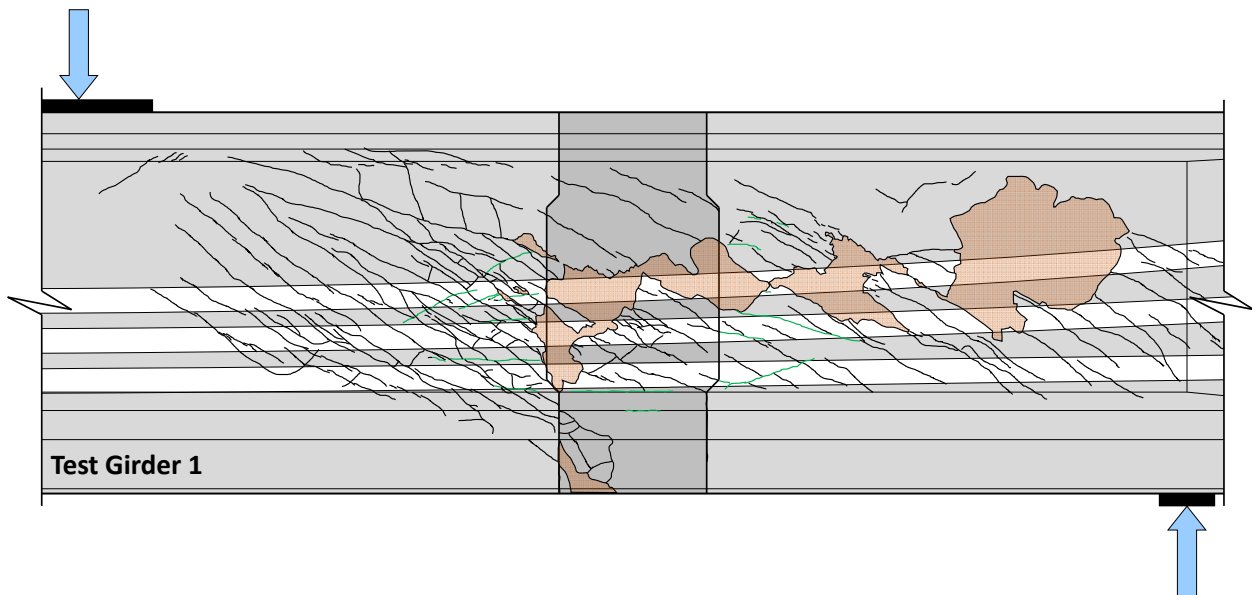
Crack pattern after failure – Test Girder 1
